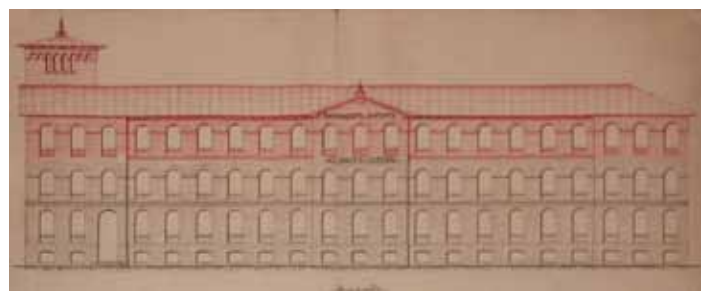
Reconstruction project of „Wicander & Larson” factory building, 1895. Architect P. M. Bertschy. [4]
